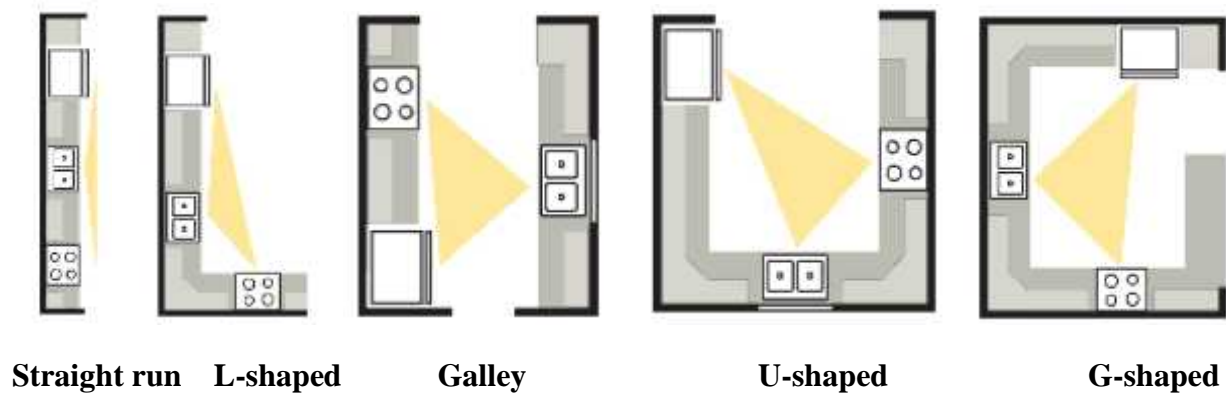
Kitchen cabinet design layouts; Source; [10]
